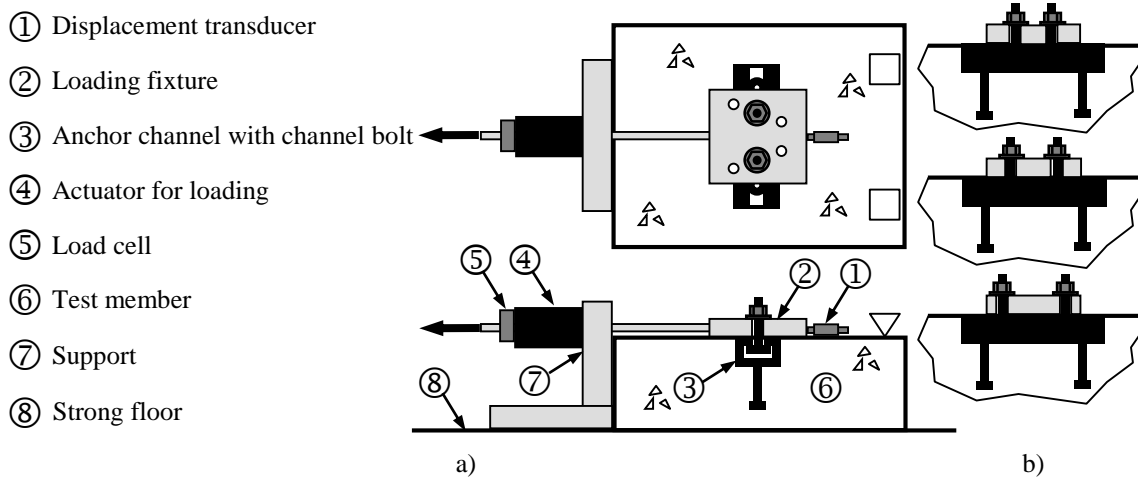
Schematic of test setup: a) Top and cross section; b) Details showing the tested anchor channel with 3 channel bolt positions.
